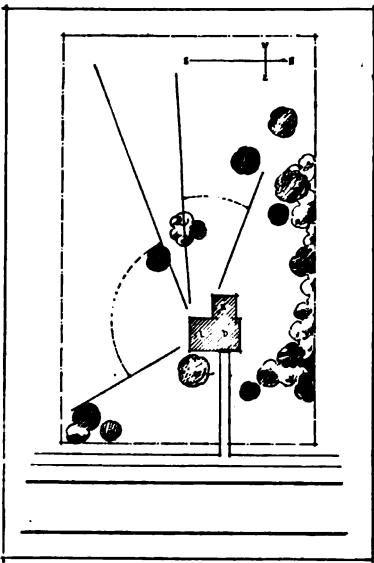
Planting plan to insure best effect of shade, outlook, protection and privacy on a lot facing east
